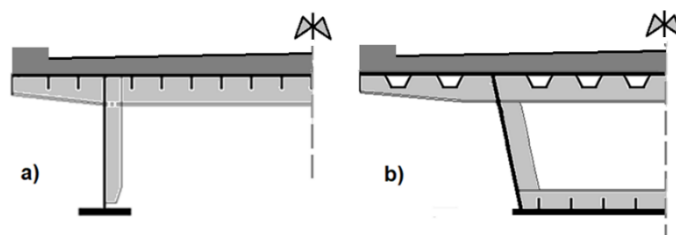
Girders with orthotropic deck and reinforced concrete slab:
